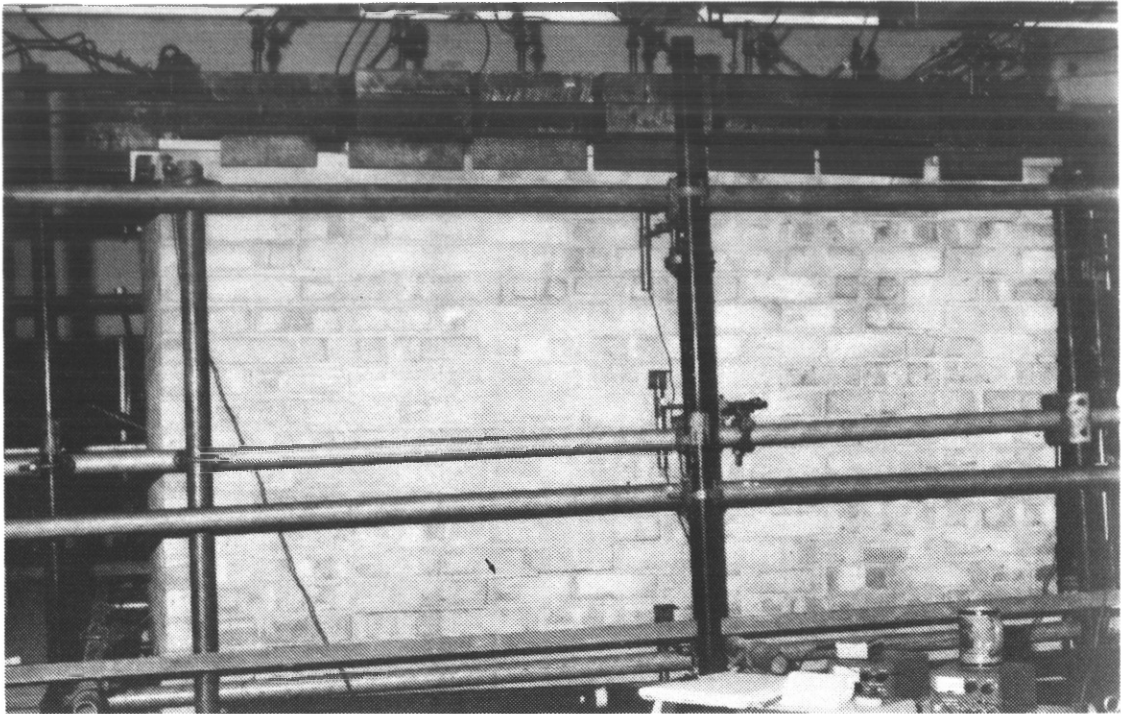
Diagonal cracking of FPSS wall after settlement (Test W1).
